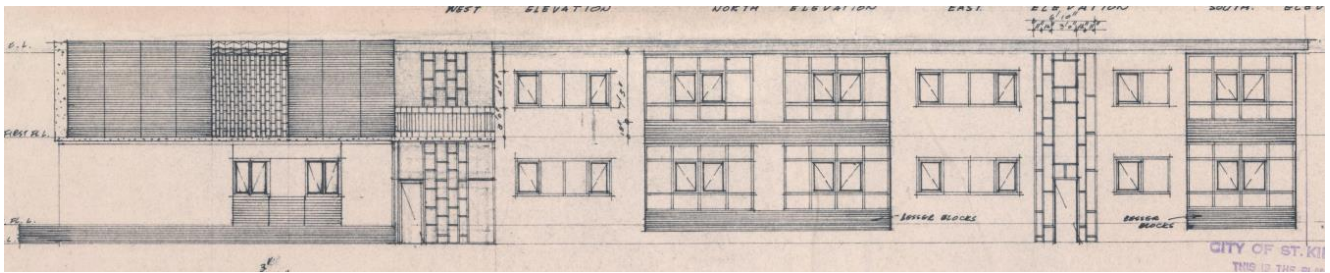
& 4 - East and north elevations, from drawings related to permit no. 57/2966 (M Feldhagen, 1963) (Source: Council Building File)
